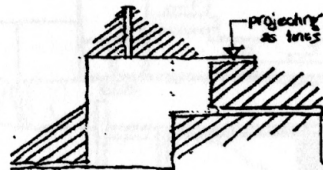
Interpenetration. Parts of a building that stretch out to landscape and project the inside to the outside.
